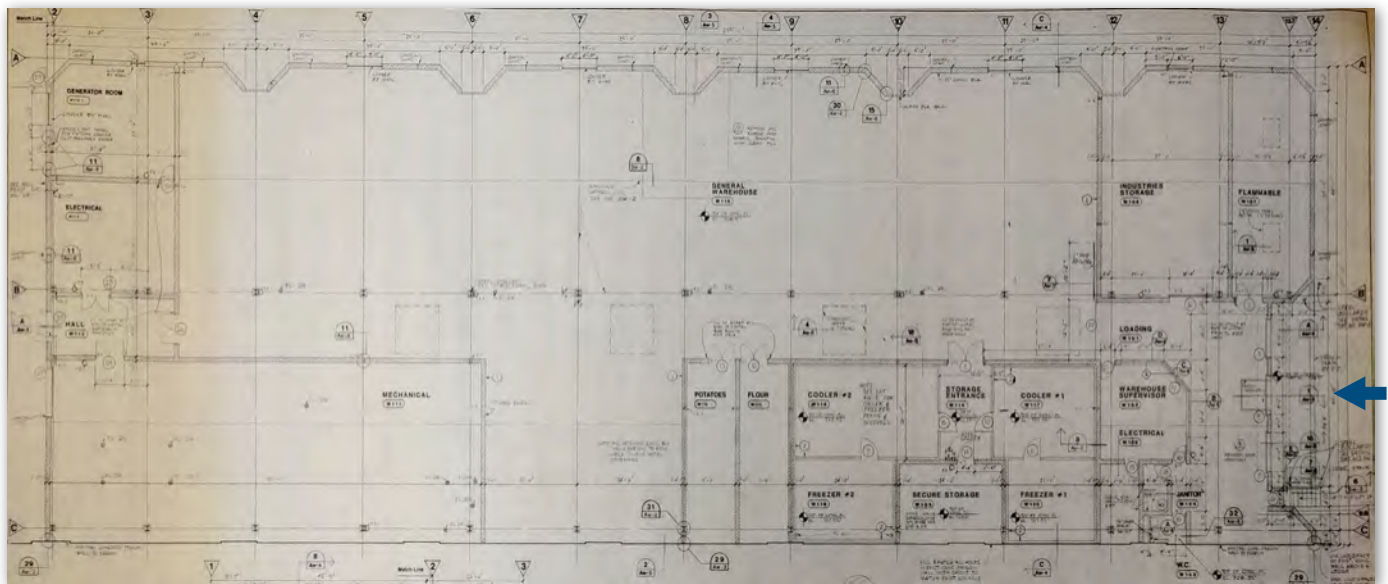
Institution Warehouse floor plan, showing the main entrance at right (SCI-Pittsburgh Facilities Archive).
